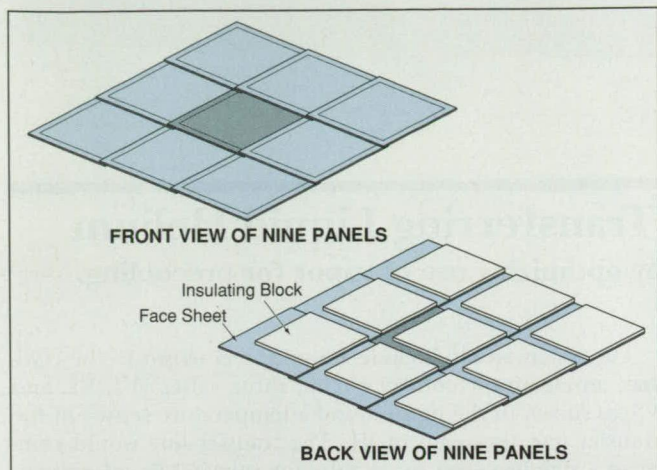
Panels Overlap and thus interlock in a two-dimensional shingle-like pattern. However, the interlock can be removed locally, to enable insertion or removal of a given panel, by simply sliding the overlapping parts of two adjacent panels out of the way.
